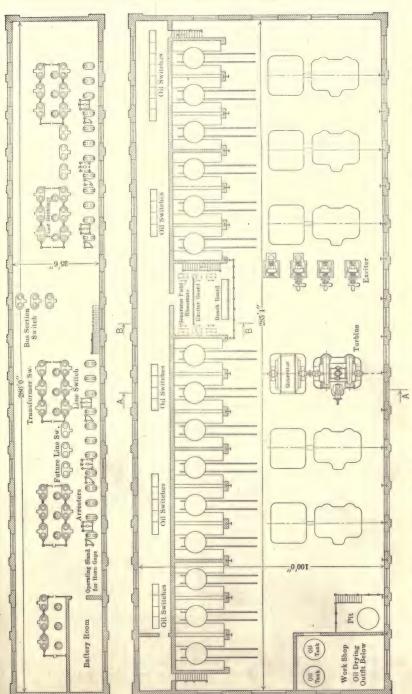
Floor Plans of Power-house of Inawashiro Hydro-Electric Power Company, Japan. (For cross-section see Fig. 97.)
